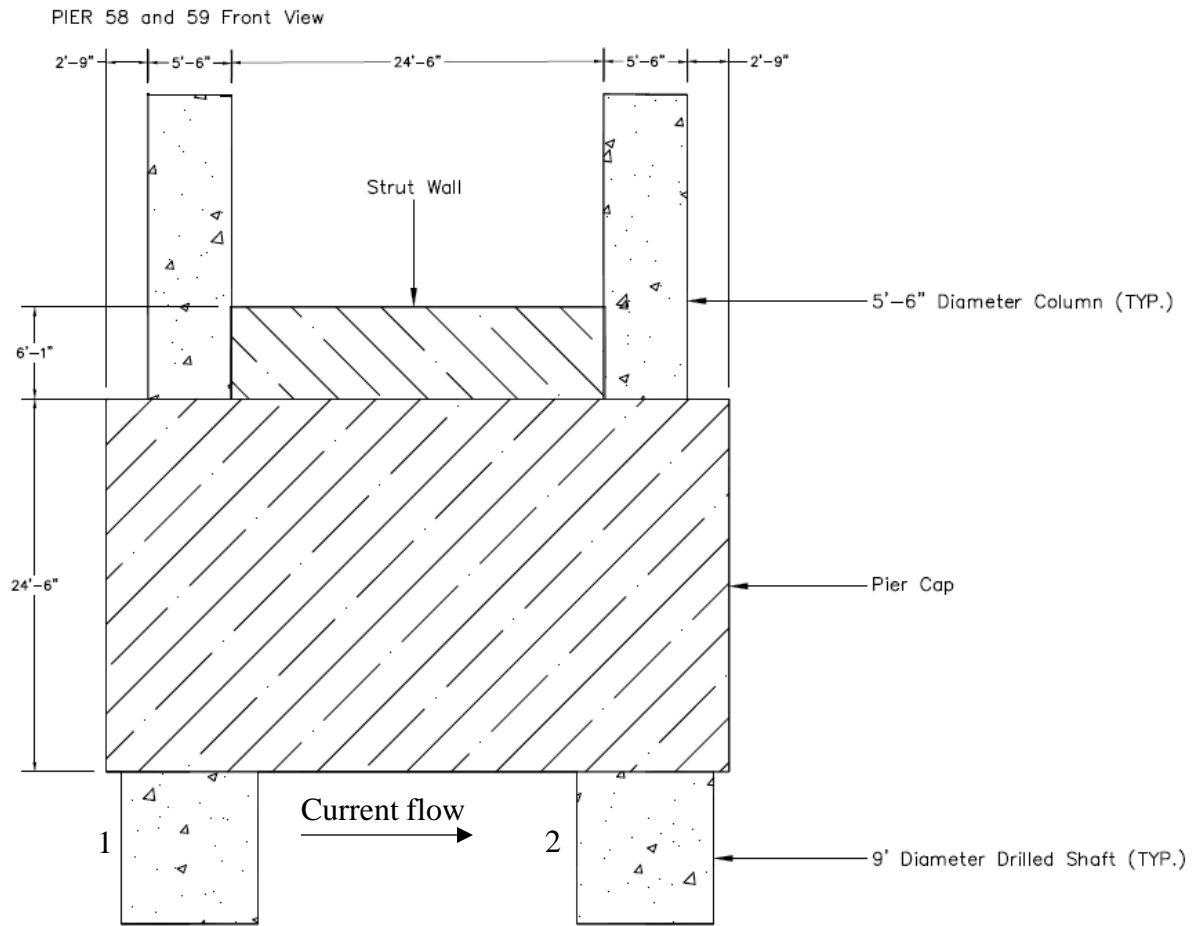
Elevation (front) view of Piers 58 and 59 looking east, river flow is to the right.
